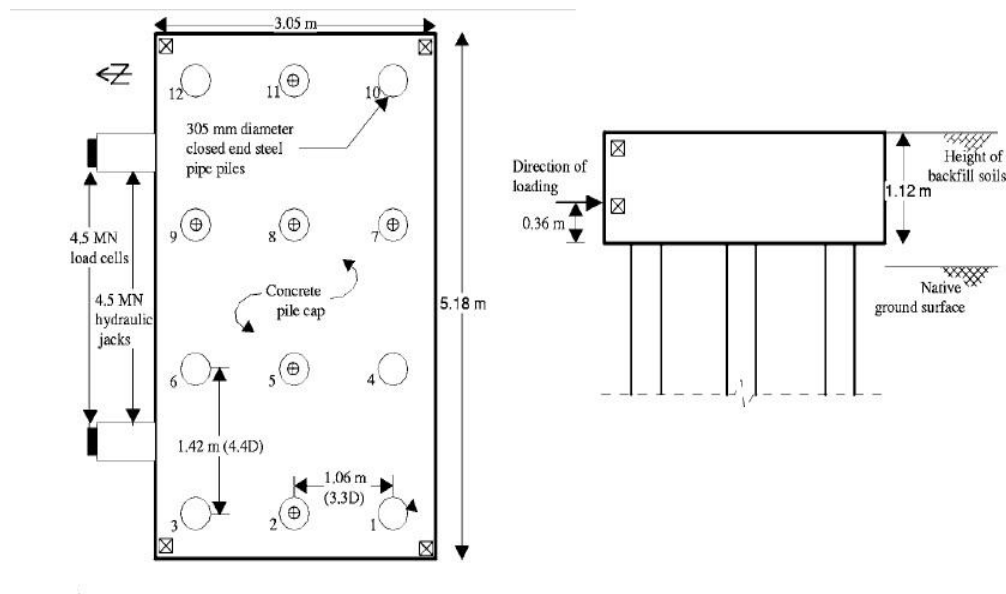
Elevation view and overview of the pile group (Rollins and Cole 2006)
